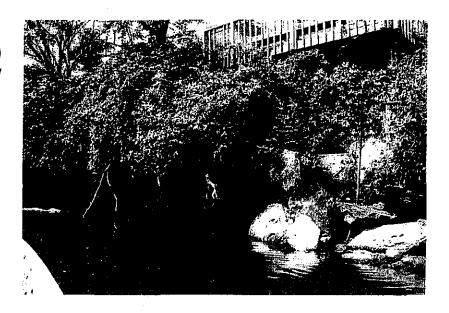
STA. 0+00 NORTH END OF CRIB FACING SOUTH (CRIB LINE TO LEFT)
